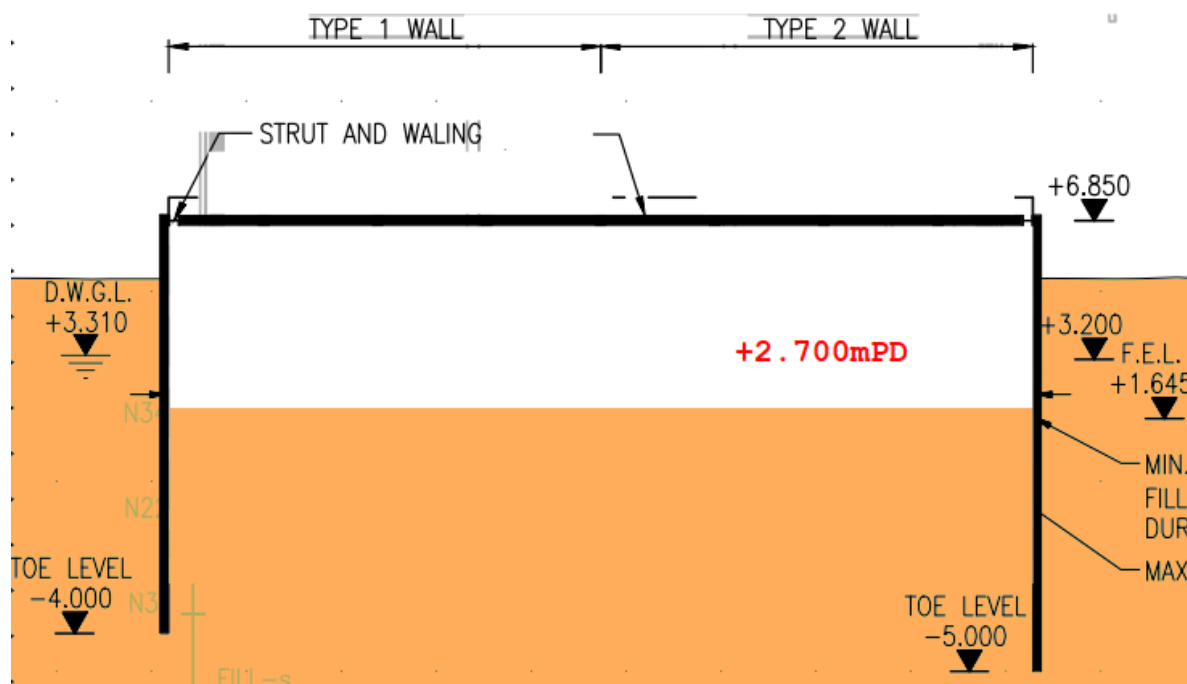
Excavation to level around +2.7mPD (500mm below waling and shoring)
